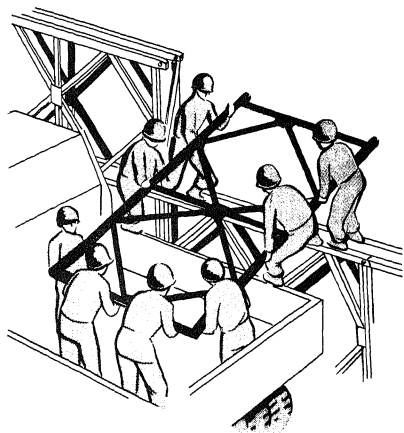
Adding second-story panels, using truck as working platform—picking up panel from truck.
